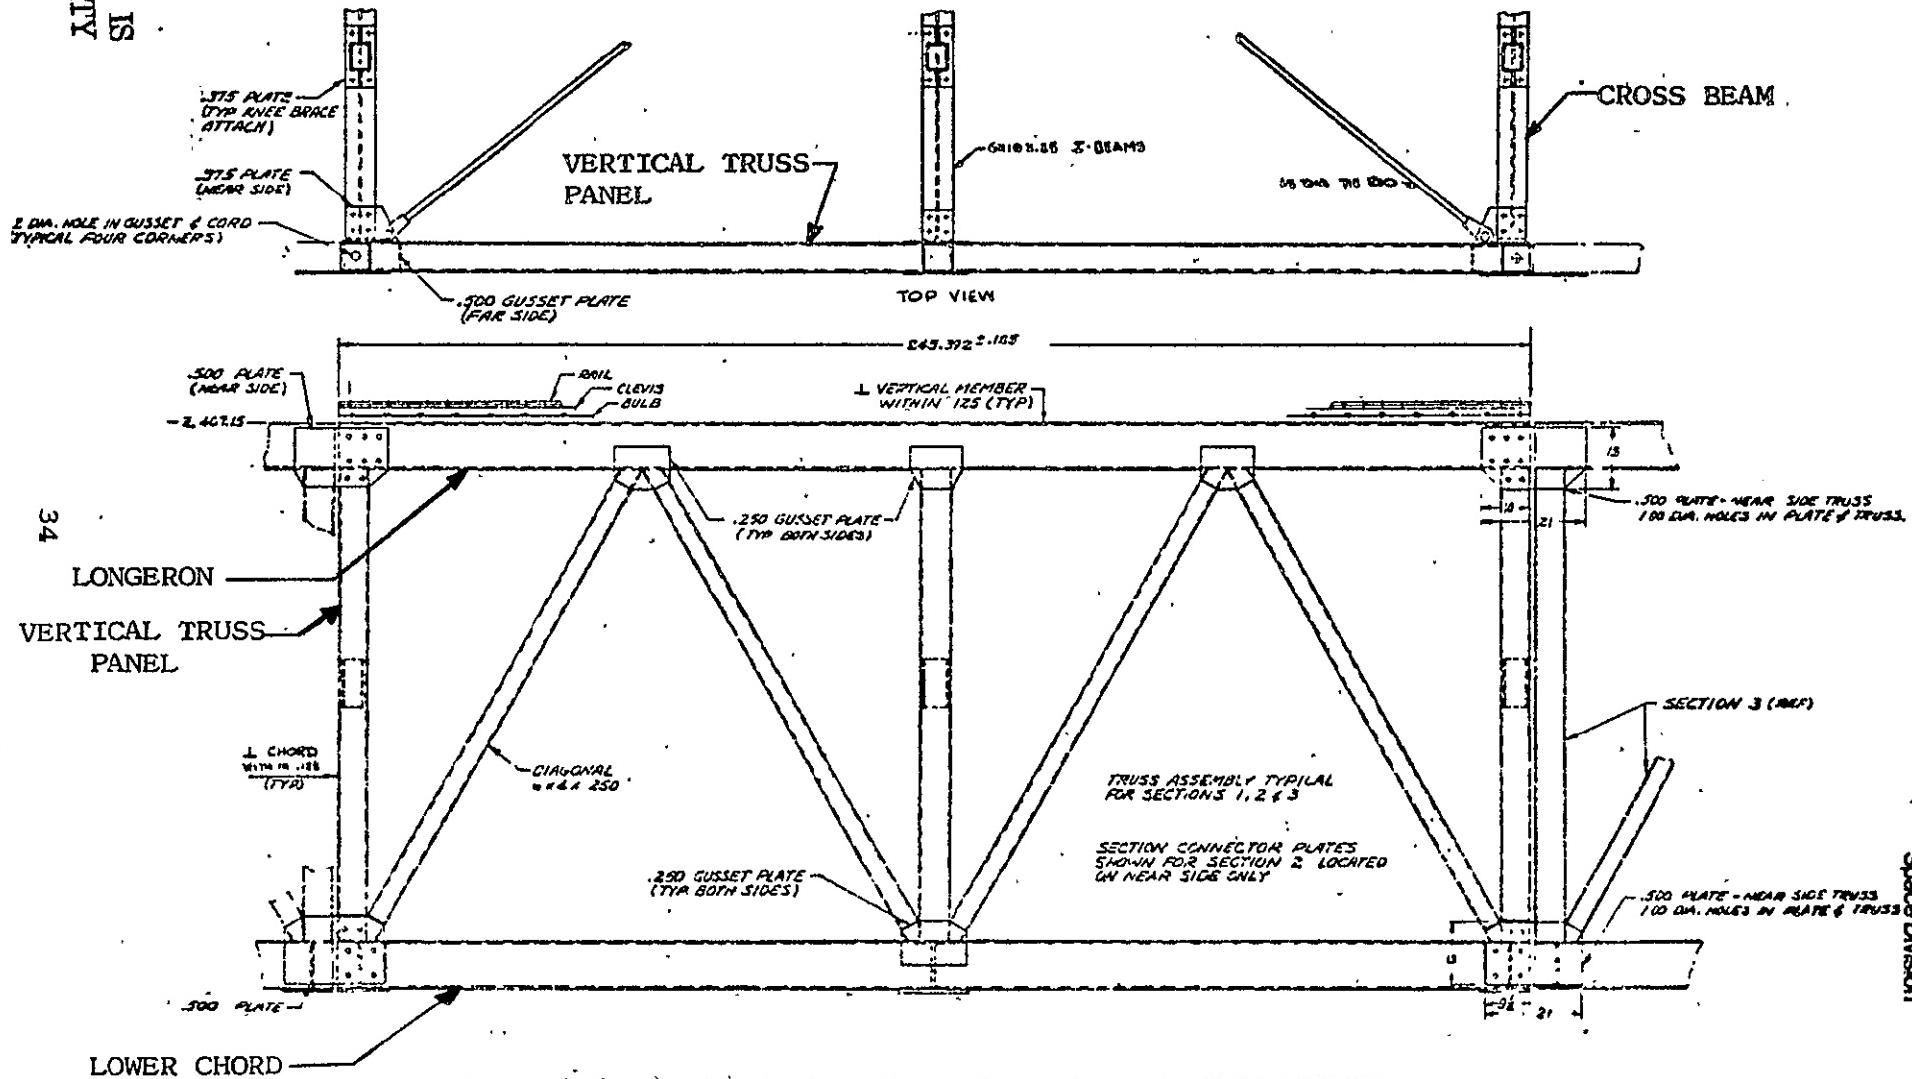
IVE PRIMARY STRUCTURE - TRUSS DESIGN
